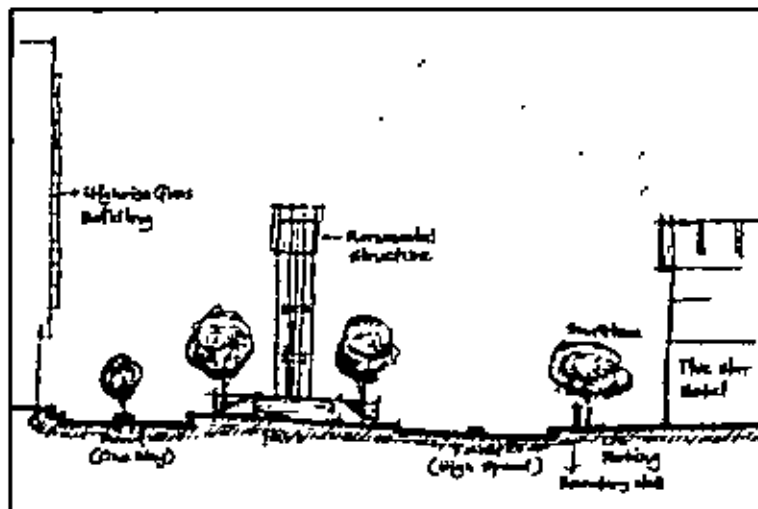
Sectional elevation near SAARC Fountain area.
